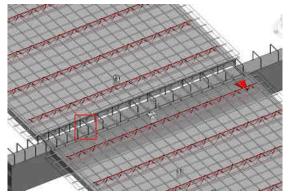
Reinforcement Collision Optimization at Beam Slab Joints
